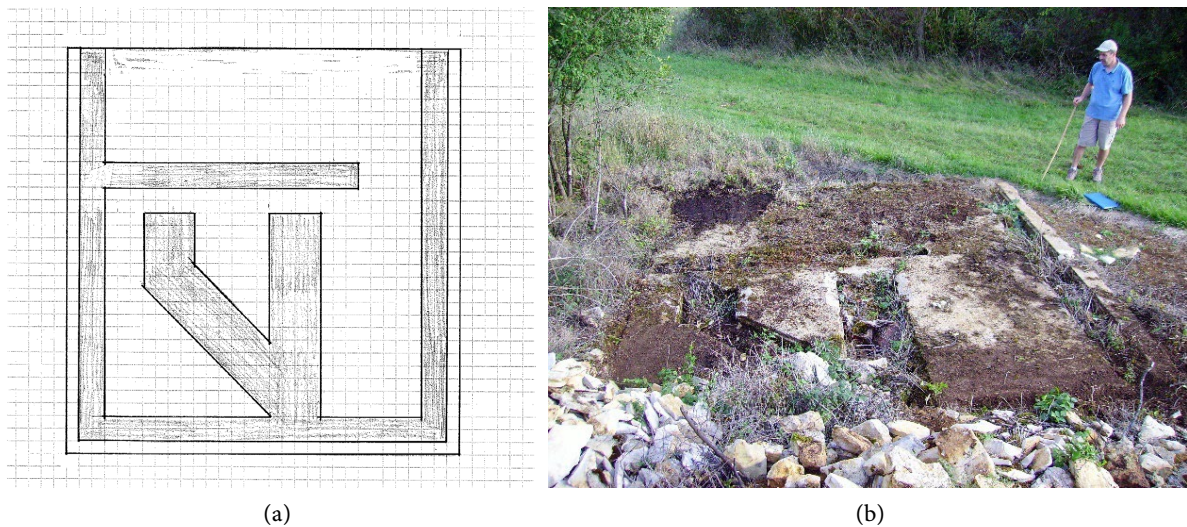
Emplacement (5)—(a) concrete platform plan, transformer—power plant. (b) thick slab with U- and Y-shaped grooves.
